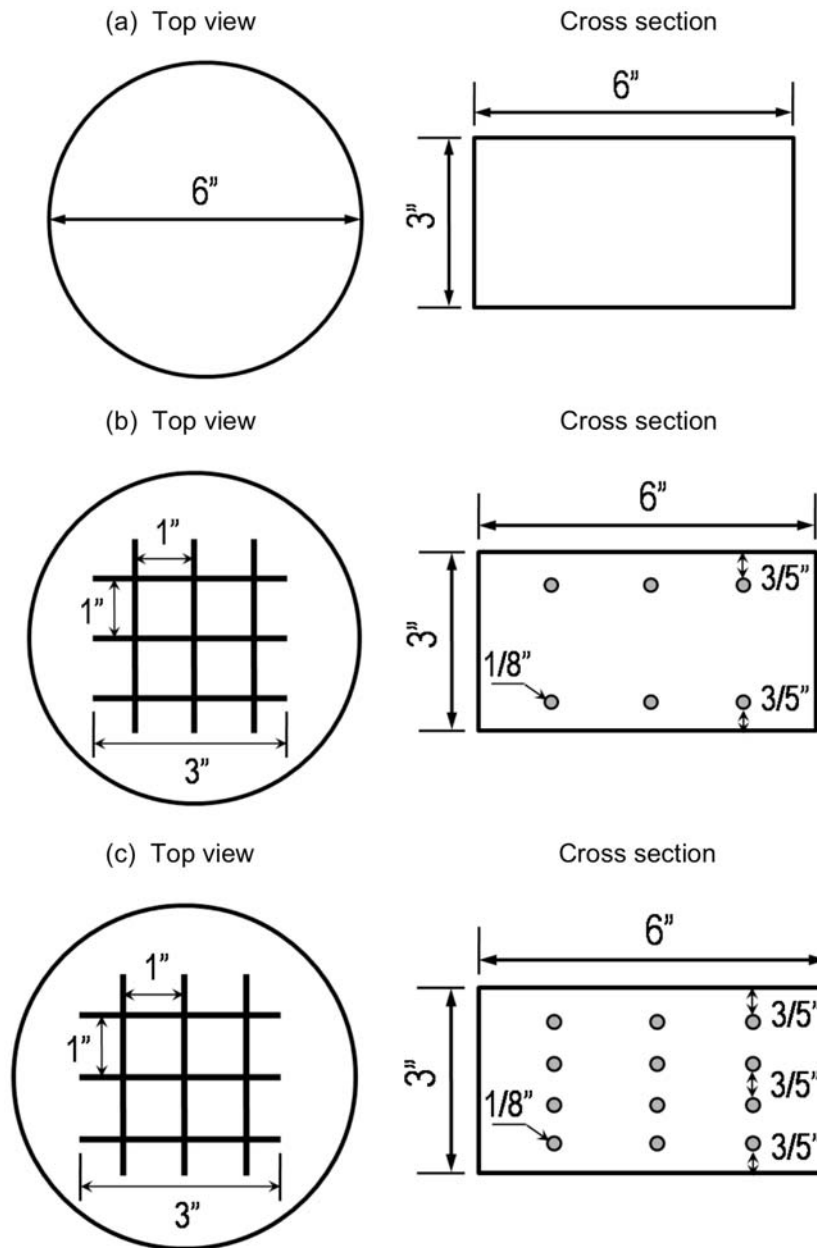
Specimens for the abrasion test: a) without steel reinforcement; b) with 0.5% steel wires; and c) with 1% steel wires.
